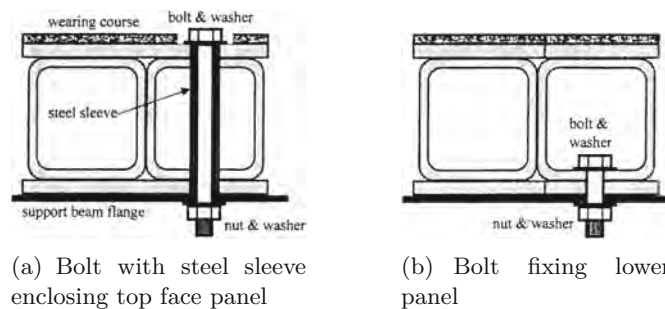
Bolted connection used with *Virginia Tech Deck* [TL00]
